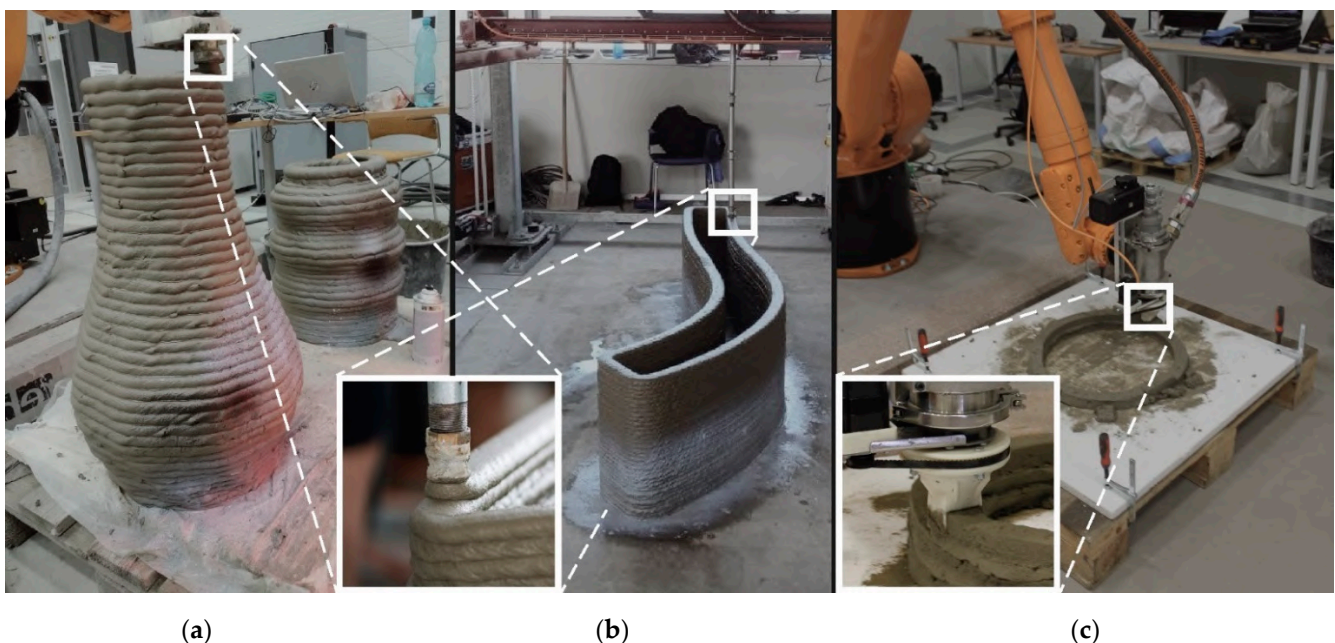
Technical equipment: Robotic arm KUKA and gantry large format 3D printer with extrusion method of print (a,b), and (c) robotic arm KUKA with CC method of print.
